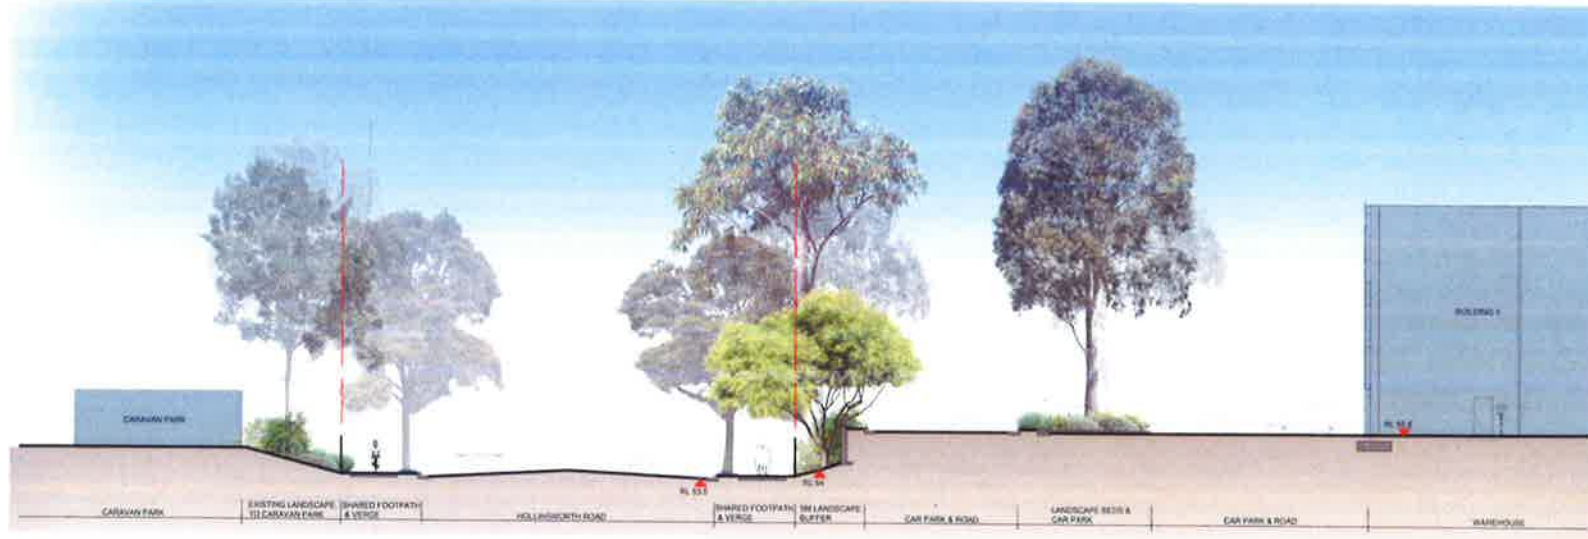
SECTION THROUGH THE NORTHERN HOLLINSWORTH ROAD BUFFER (BUILDING 3)
